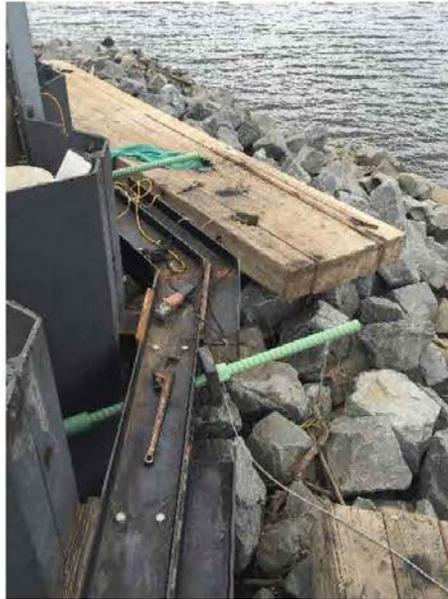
View of repaired water section, HP8 segments, tie-rod extensions, and pack-outs, facing east.
